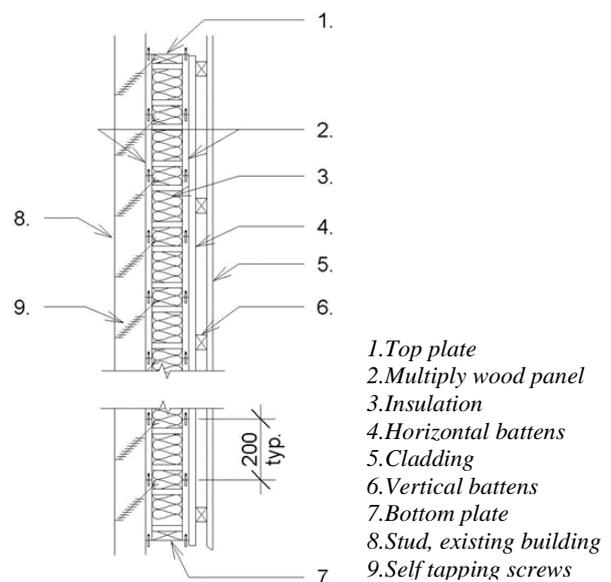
Vertical cross section, rehabilitation of light frame wall with the patented modular wall system
